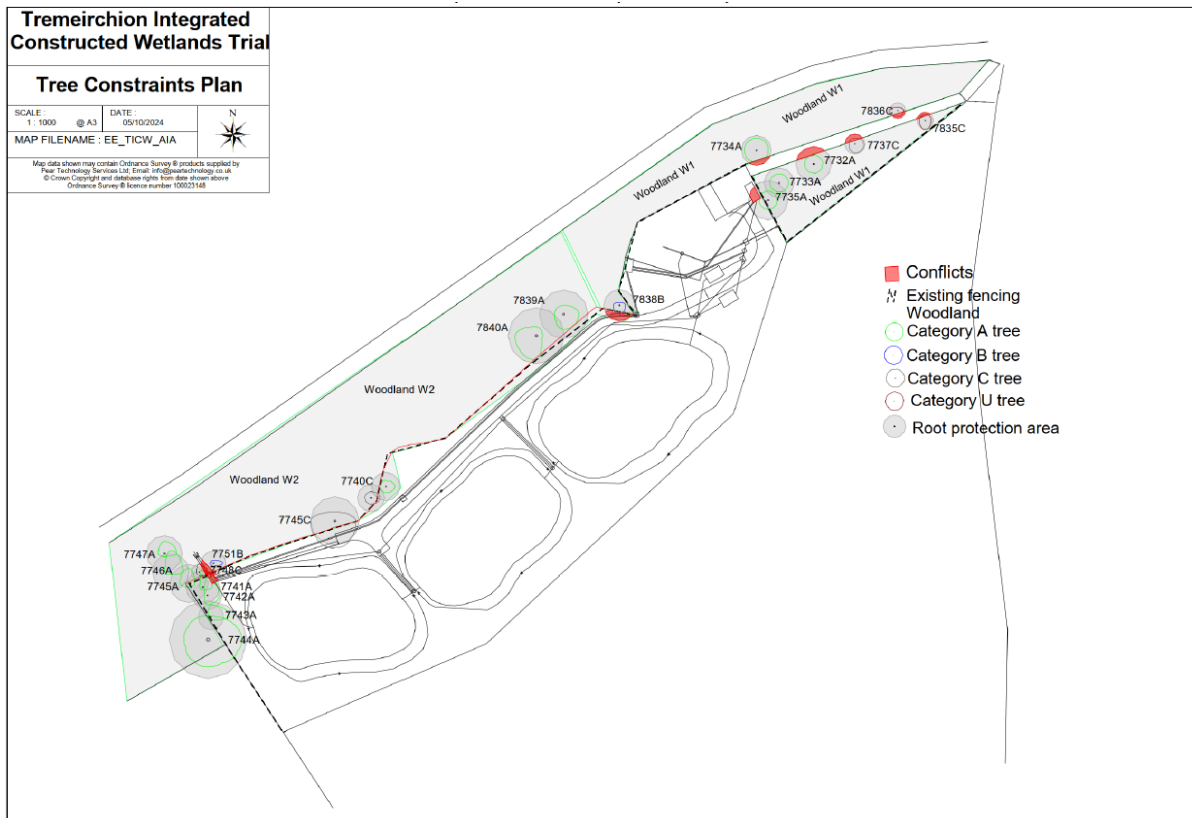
Tree Constraints Plan for the Tremeirchion wetland site
